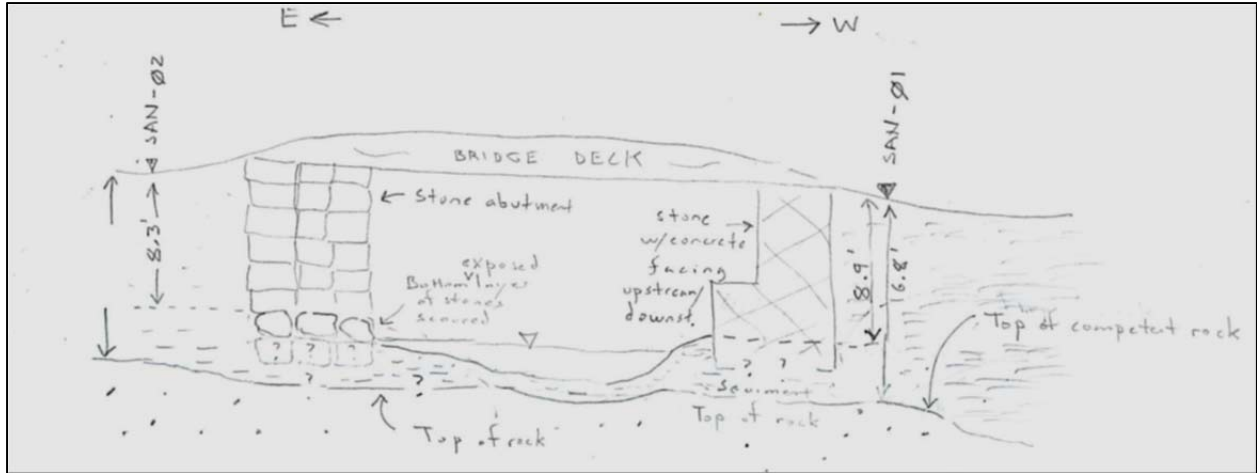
Field sketch of Little Sandy Bridge, looking downstream.
